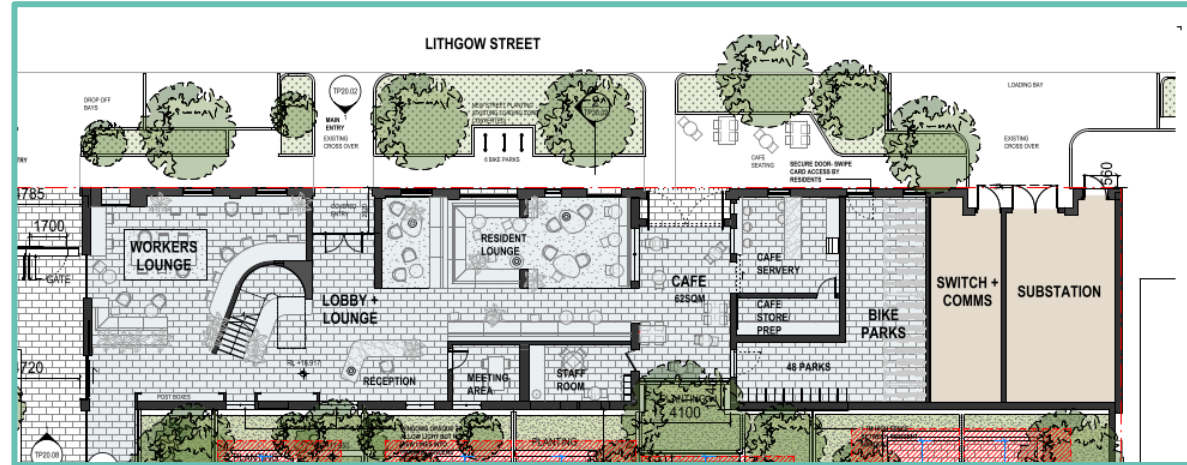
Ground-floor plan for the retained warehouse building. Source: Warren and Mahoney.
